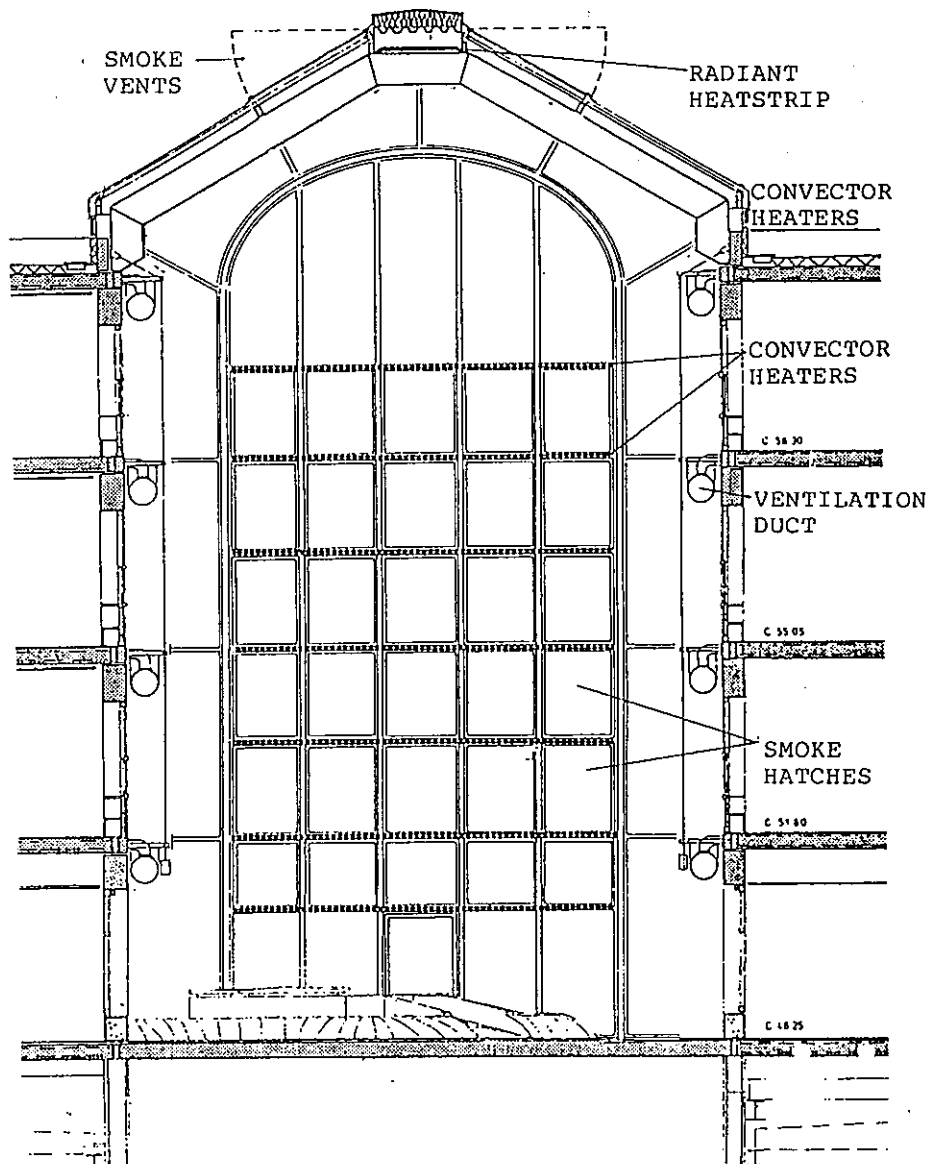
Cross section and gable wall of atrium with heating and venting systems.
